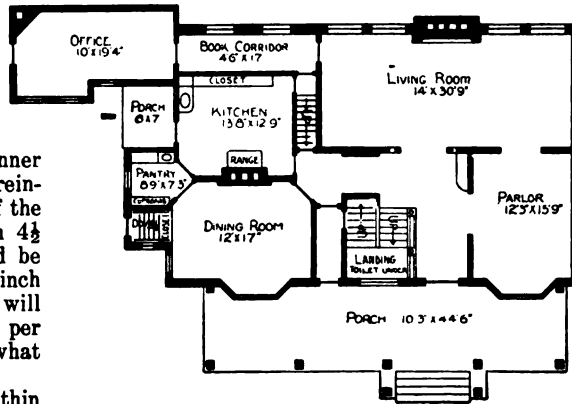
Ground-floor plan of dwelling shown in Fig. 284. The office or "den" is an important adjunct to a modern farm dwelling, providing a place for administration and obviating the necessity of receiving all callers in the residence part. It should have an outside door and be accessible from the barns and fields. In general, it is better that the kitchen have more than one outside window, but in this case there was special reason for setting off the kitchen from the side yard.
